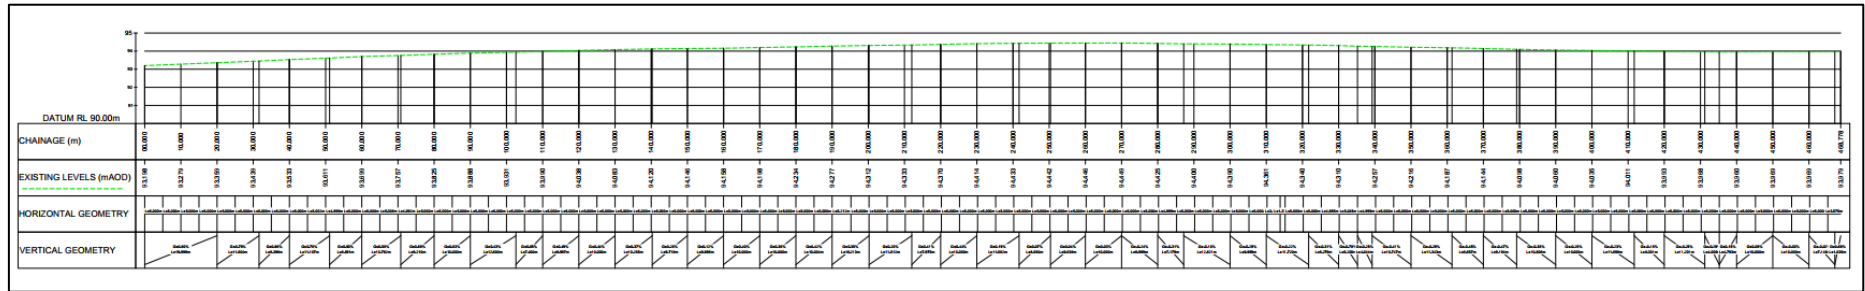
Existing Ground Elevation Profile of N11 Mainline Approaching L5046 Johnstown
